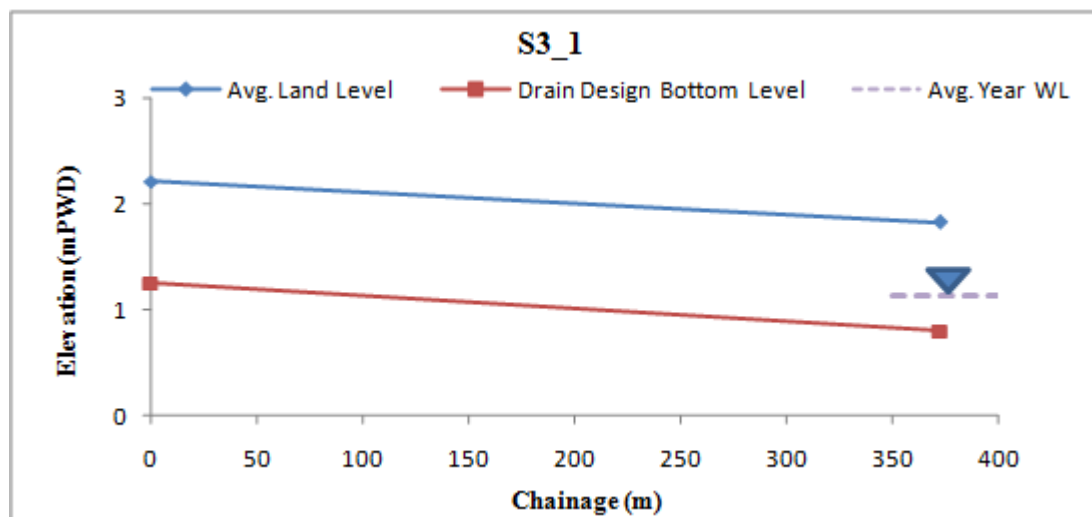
Sample Longitudinal Drain Section of drain S3_1
